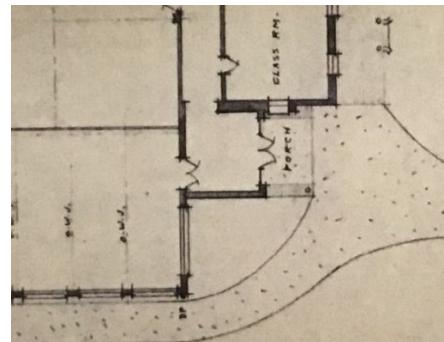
Detail from 1961 existing conditions plan which shows the entrance to Norman Smargon House through the eastern wall rather than via Malmsbury Street. Presumably this was altered when the Bet Nachman Synagogue was built. (Source: Public building file Unit 306, PROV, reproduced in Lenkiewicz et al. 2017)
